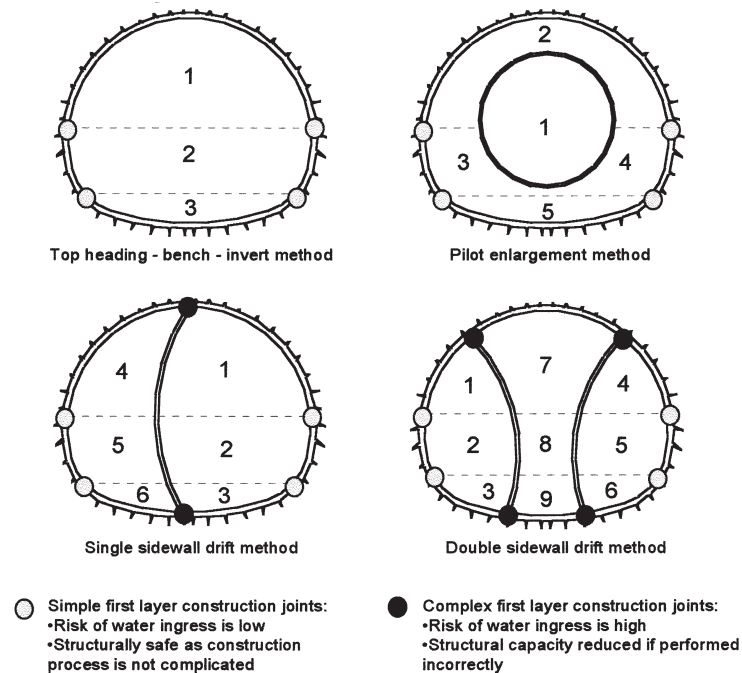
Joint types for sprayed concrete lined tunnel excavation methods (only joints in final lining indicated)
